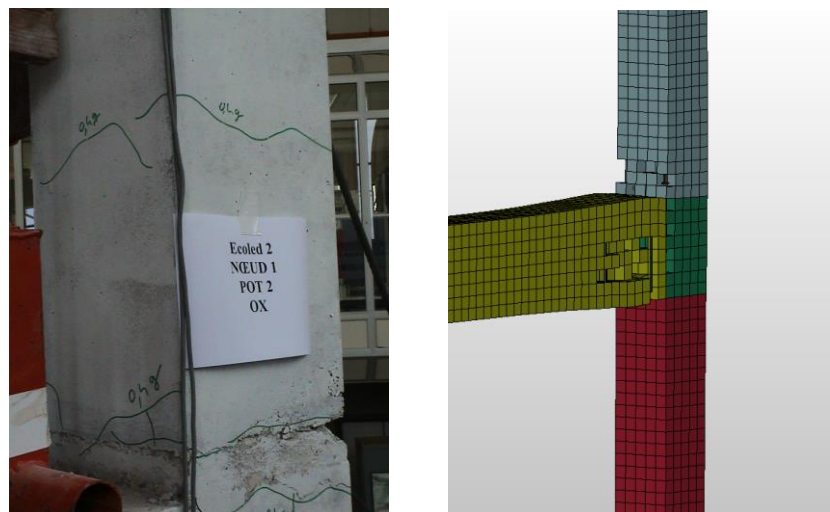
(photo on the left) cracks and spalling of concrete in the first-floor left side beam-column connection at PGA level of 0.4g observed in the experiment (photo on the right) resembling similar concrete spalling and cracking in LS-DYNA using CSCM
